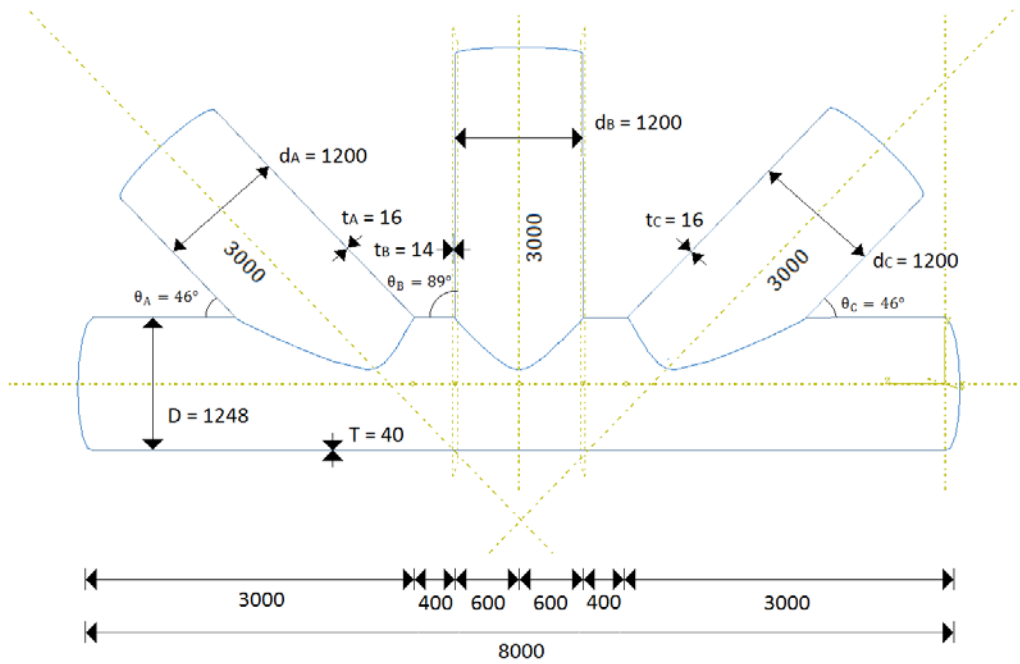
Geometry of tubular joint 13 (all lengths: mm)
